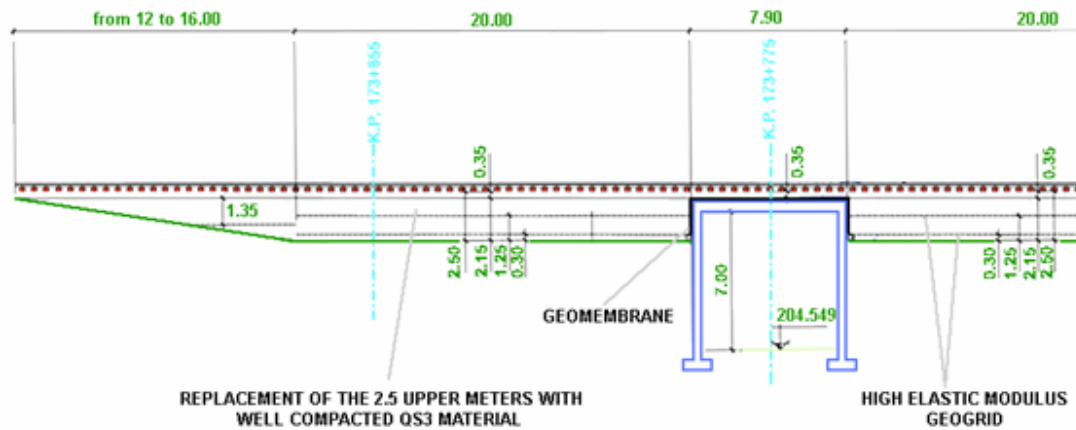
Geogrid design adopted to improve the transition zones at Montagut
